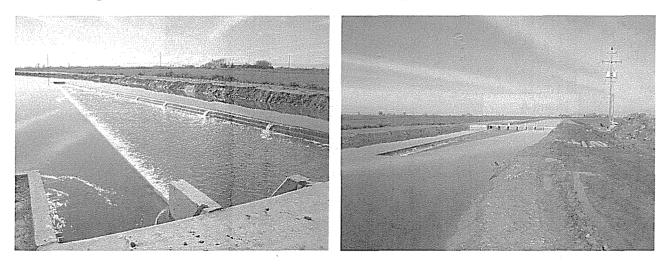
Long-crested weir installed on the Delta Canal d.s. of HWY 152.
